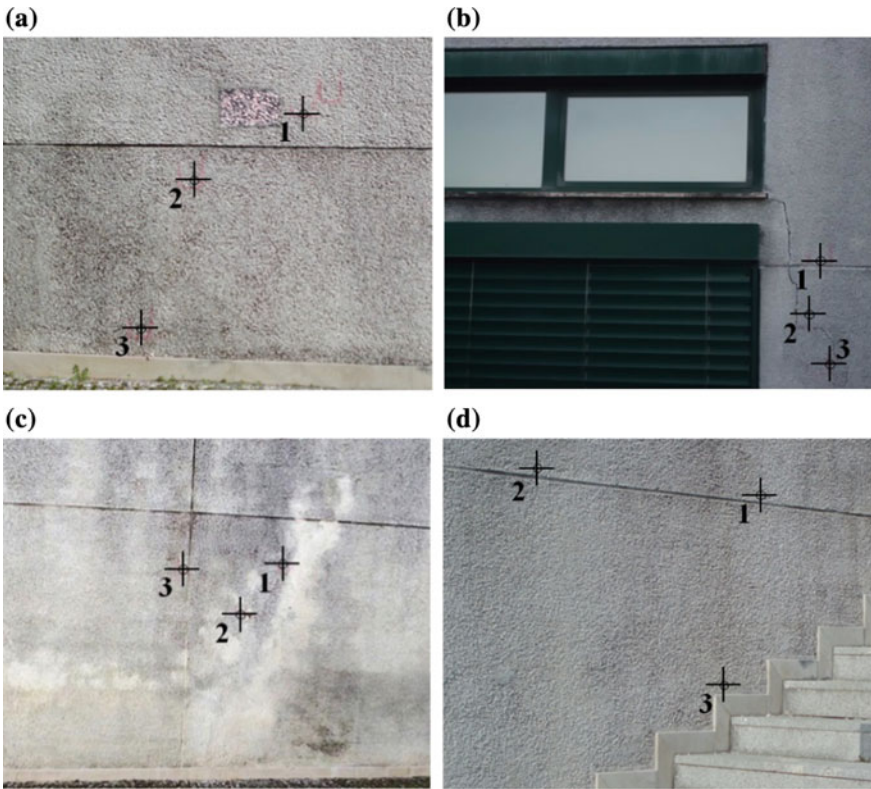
Walls under study with measuring points: a Wall 1; b Wall 2; c Wall 3; d Wall 4
